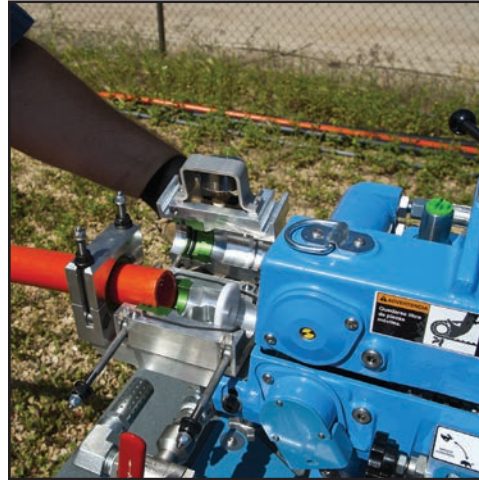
Open Conduit Clamp Cover & Air Block Cover
